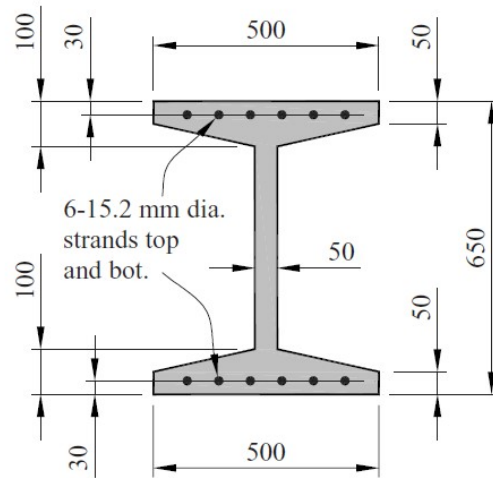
Cross section and reinforcement configuration for beams tested by Voo et al. (2010).
